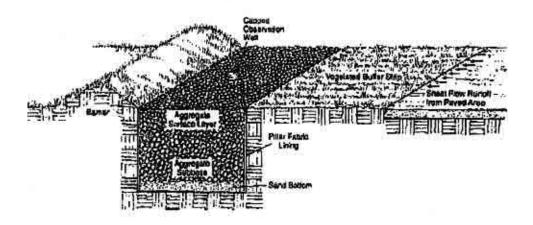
Infiltration trench detail (Source: GSWMM, 2001)
